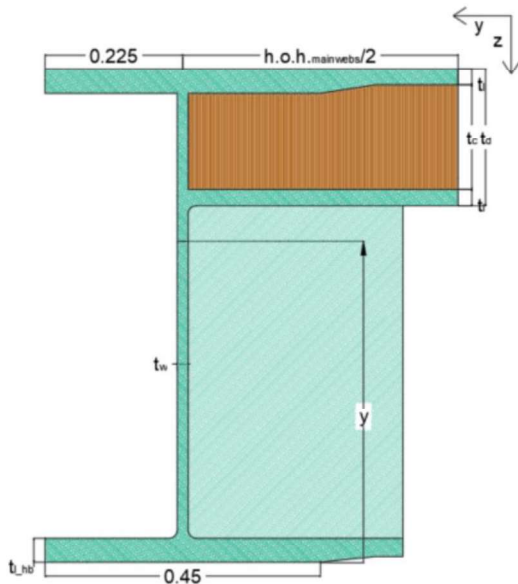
, Outside fictional beam MS variant 4, FRP box structure (full FRP).
